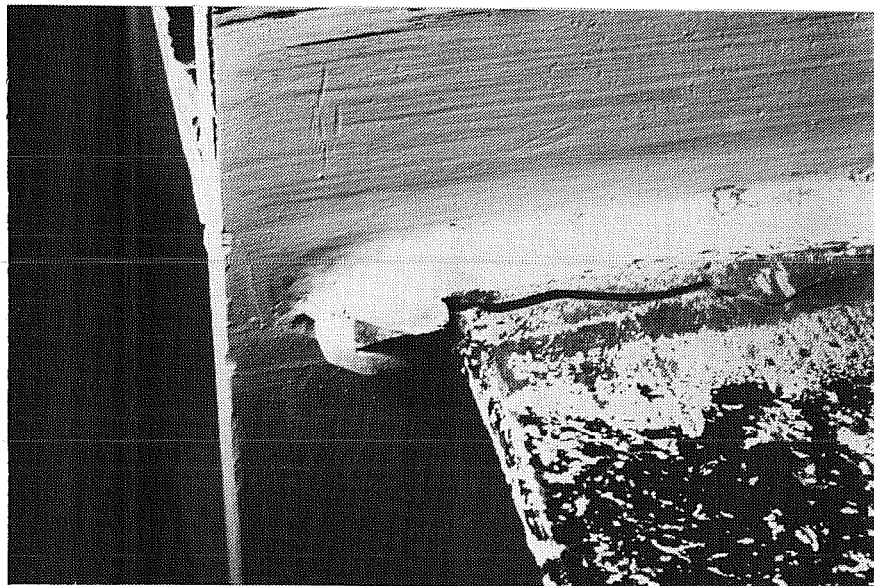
Top Flange Failure in Specimen 5
